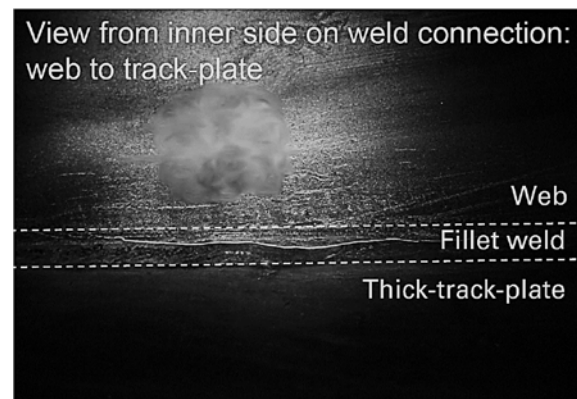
Crack arising at inner side longitudinal weld of trough tests.
